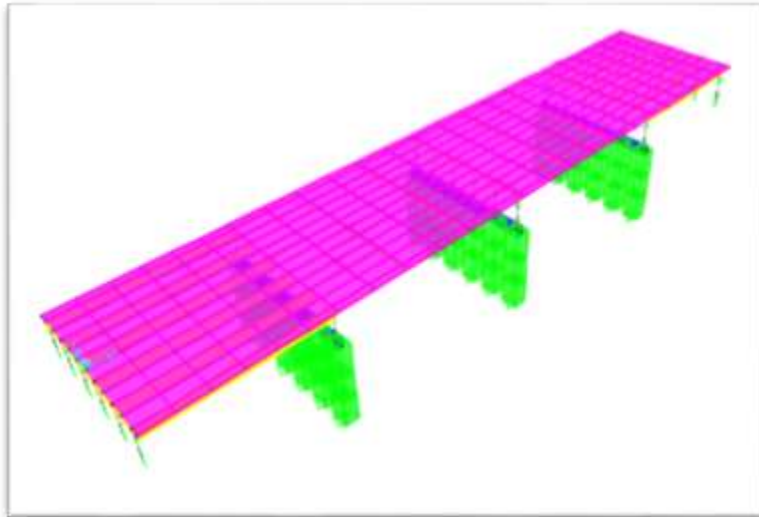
Structural model of Bagdad Road Bridge created in CSiBridge® 15.
